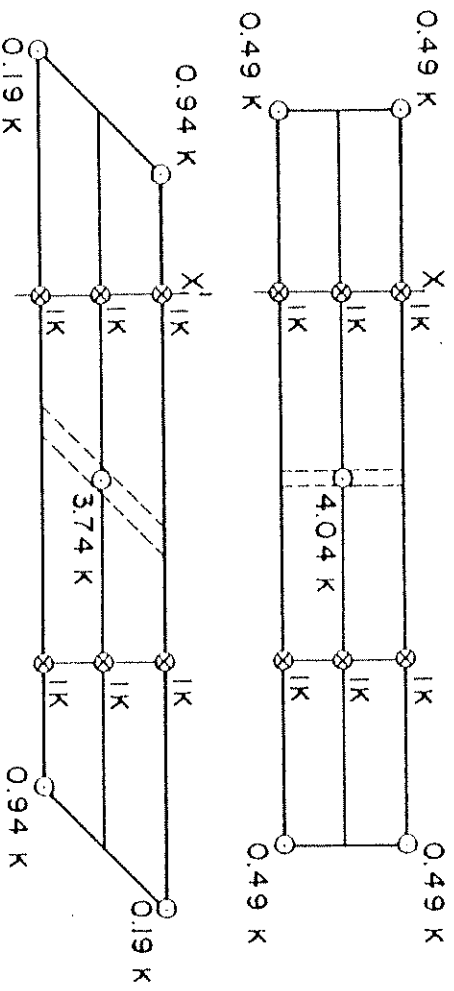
SUPPORT REACTIONS FOR TWO SPAN STRAIGHT AND SKEW BOX GIRDERS
